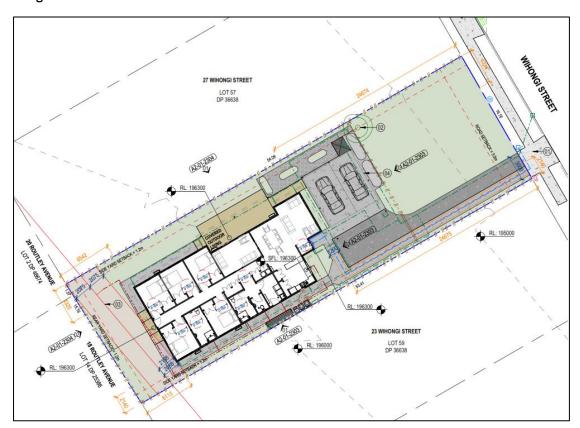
Site plan. Source: Appendix 2: Architectural Drawings.
